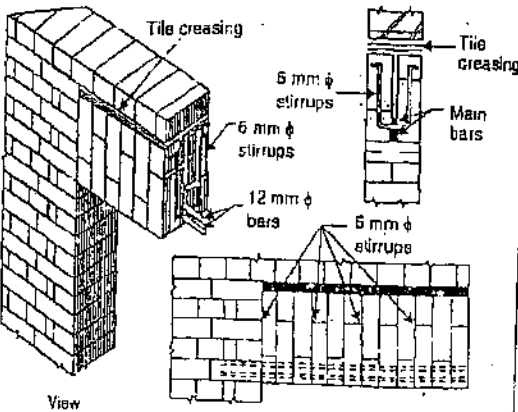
HORIZONTAL REINFORCEMENT IN WALLS.
